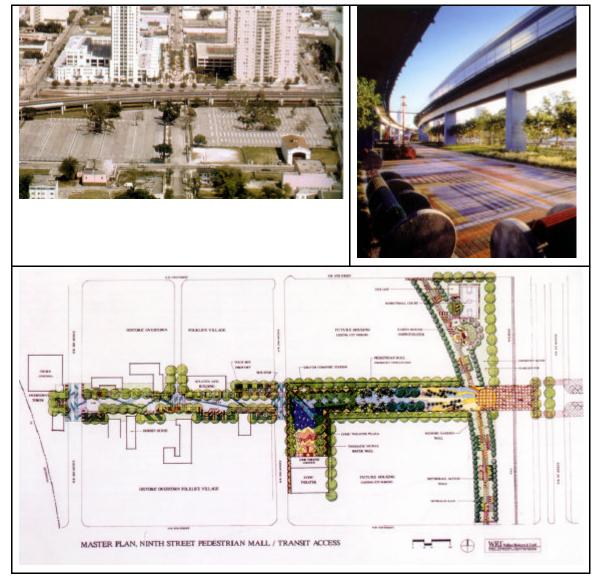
Examples of utilization of vacant land under elevated structures as an urban space : Overtown project in Miami (excerpted from Redesigning City Squares and Plazas)
